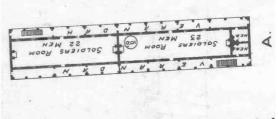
1926 1/F Plan, extracted from the 1926 Whitfield Barracks Skeleton Record Plan, sheet 2/2 (Source: PRO HKRS913-1)
